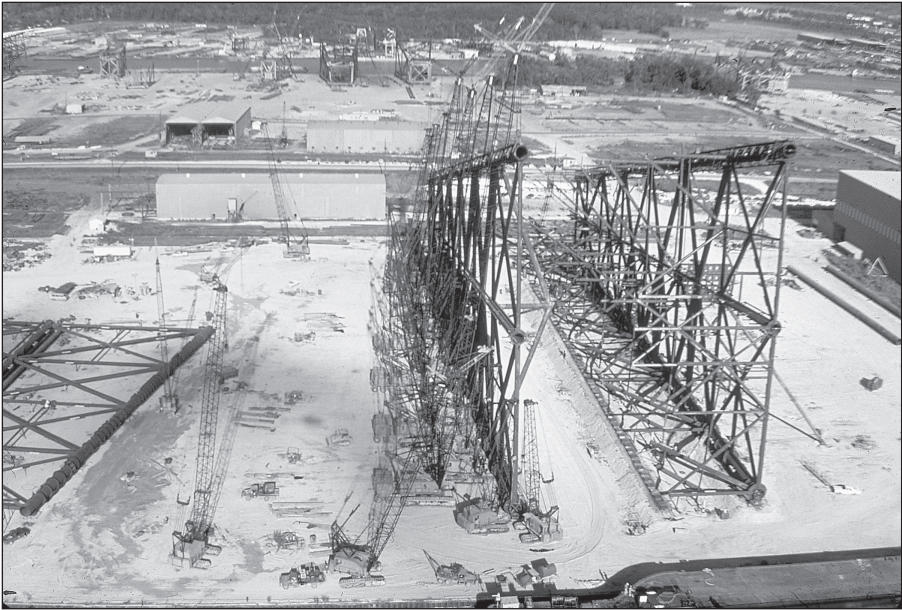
Construction cranes rolling up a steel frame for a deepwater jacket. (Courtesy Shell E&P)
